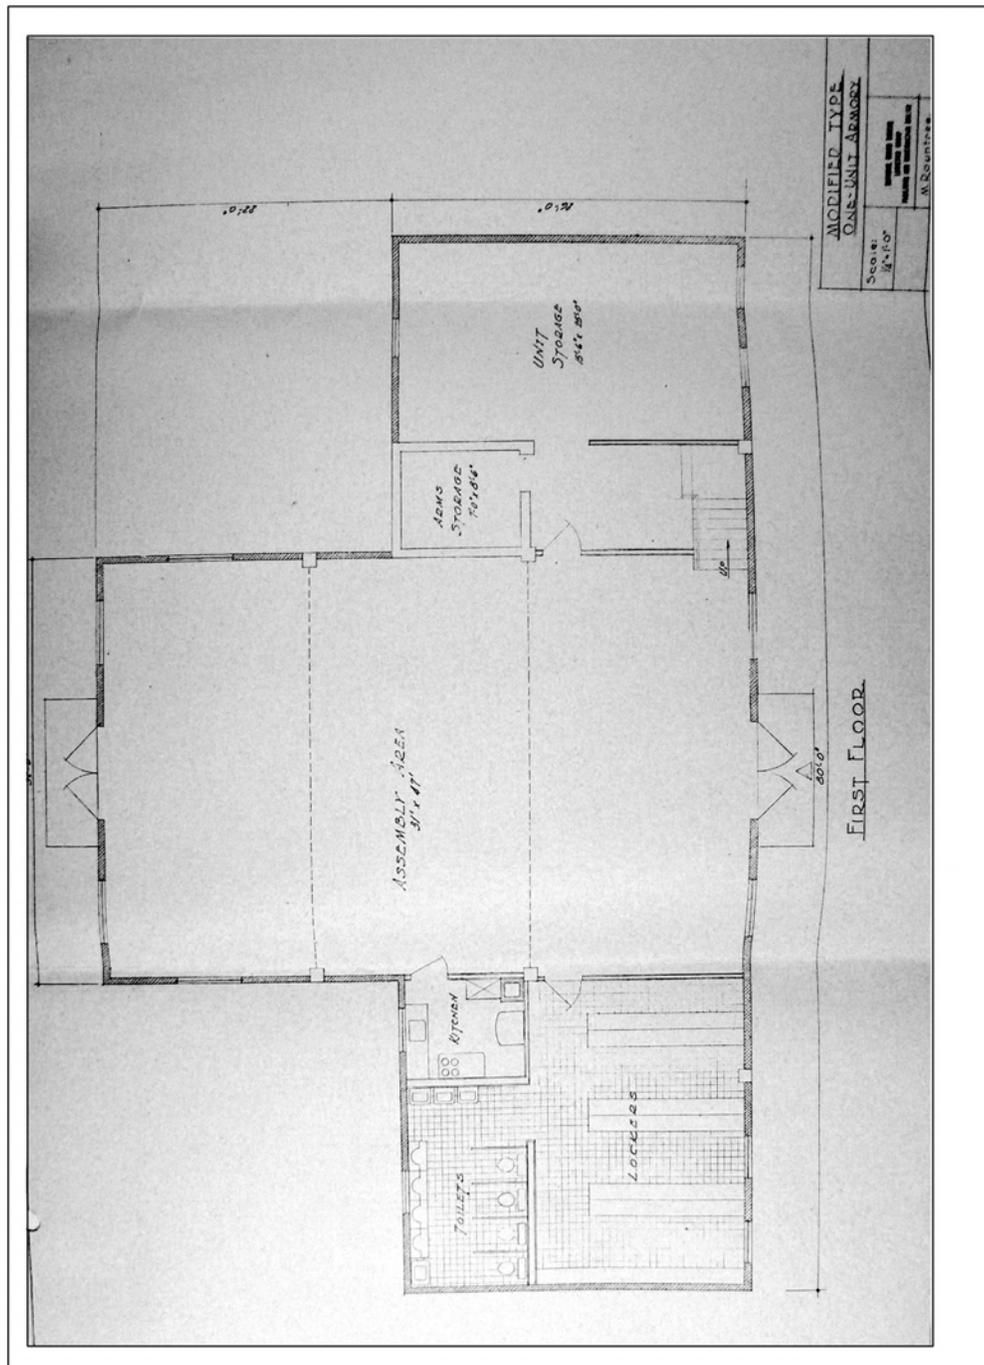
First-floor plan drawing for a one-unit armory, 1948 (courtesy of the National Archives II, College Park, MD, Army-National Guard Bureau Decimal File, 1946-1948, RG 68).
